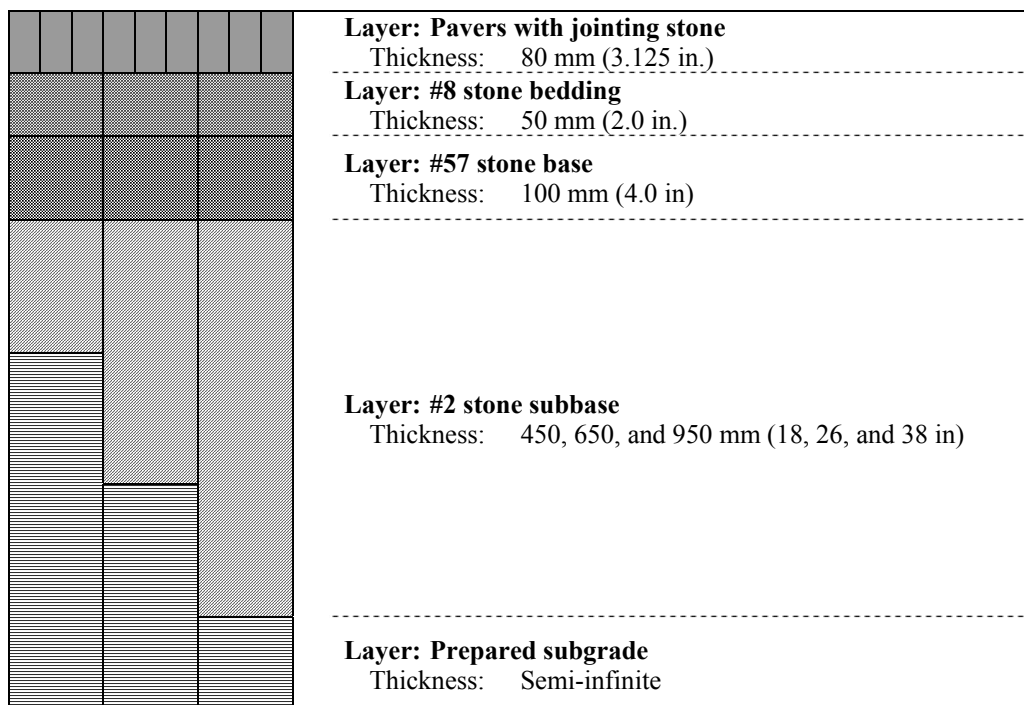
Proposed pavement structure for PICP test track (*not to scale*).
